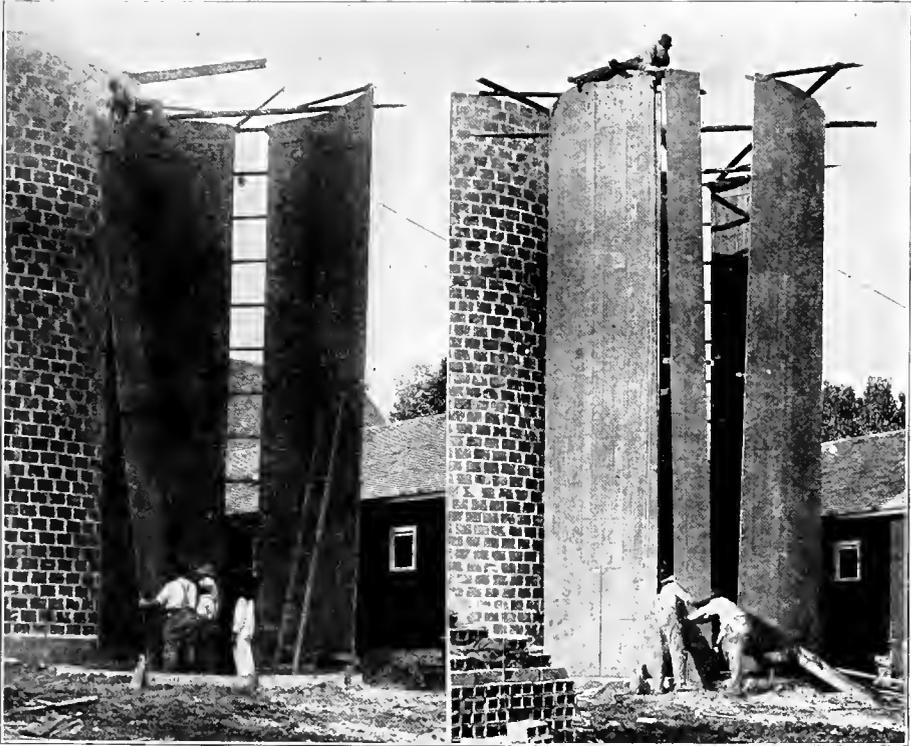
Erecting a Stave Silo without scaffolding. Door frame in place and raising staves. Courtesy of the Iowa Experiment Station
